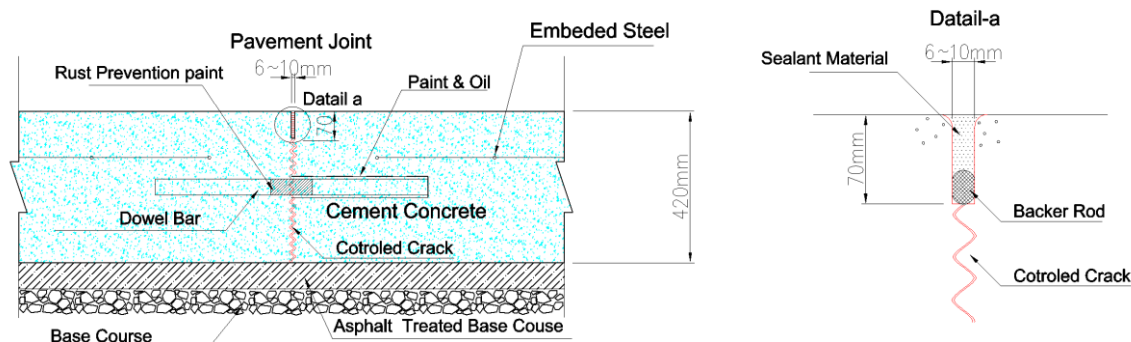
Concrete pavement cross section (left) and pavement joint (right)
